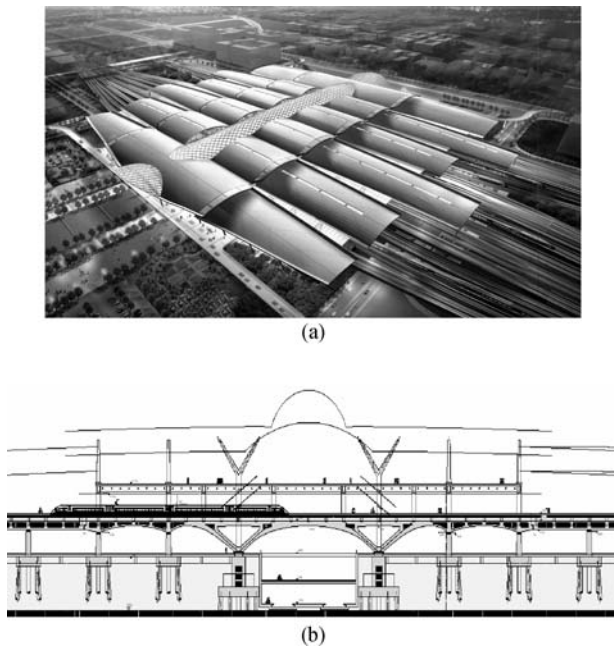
New Guangzhou Railway Station. (a) Outline; (b) main structure
